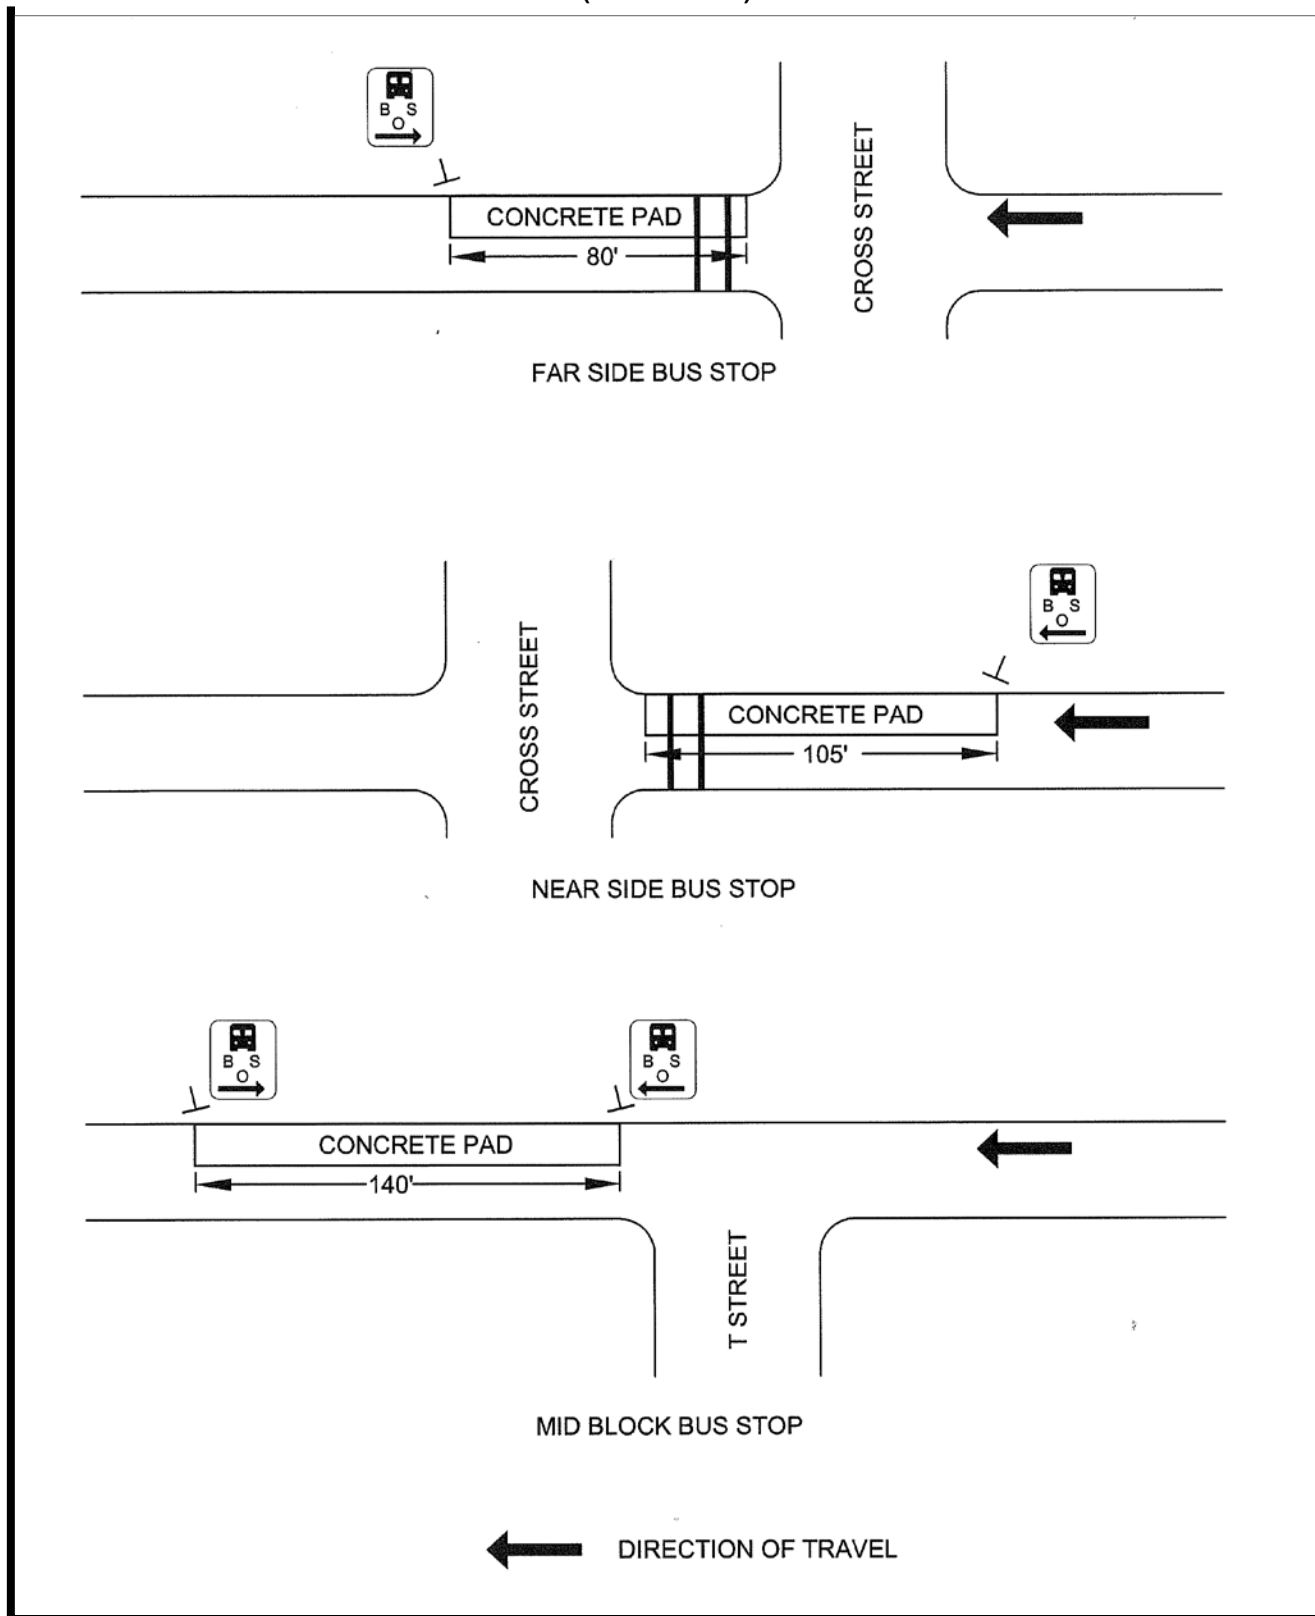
Roadway Pavement Detail for Curbside Bus Stop Pads
